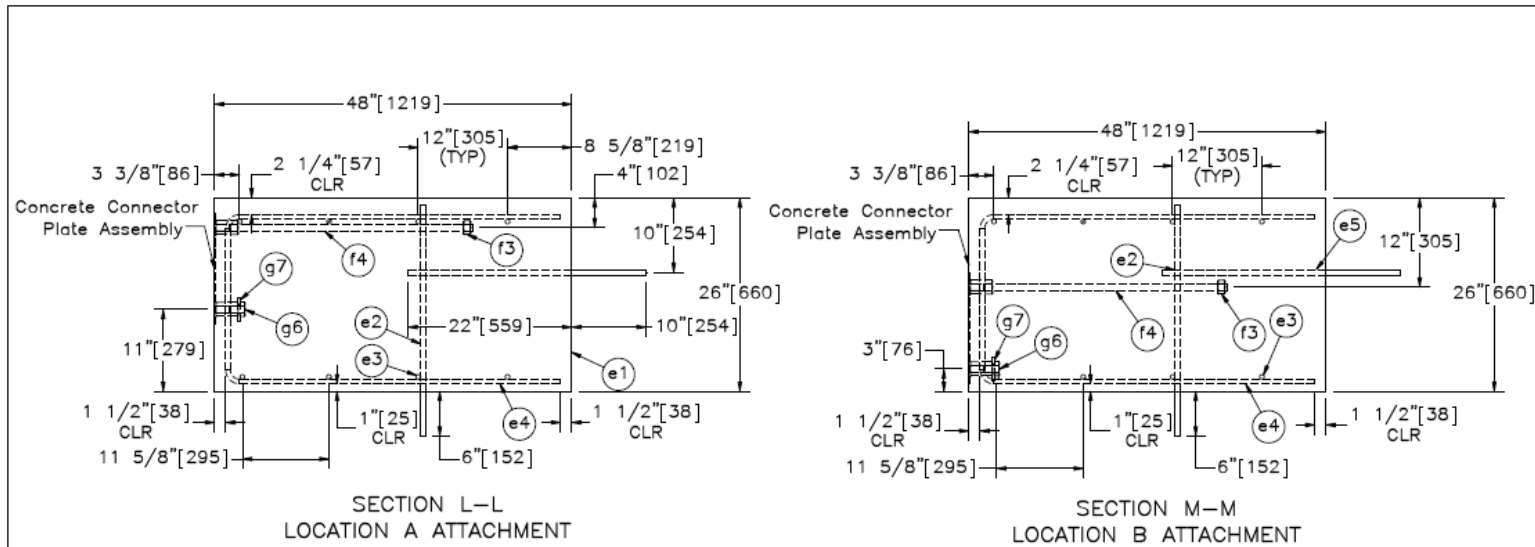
Test Slab Assembly Details, Test No. STBR-1
